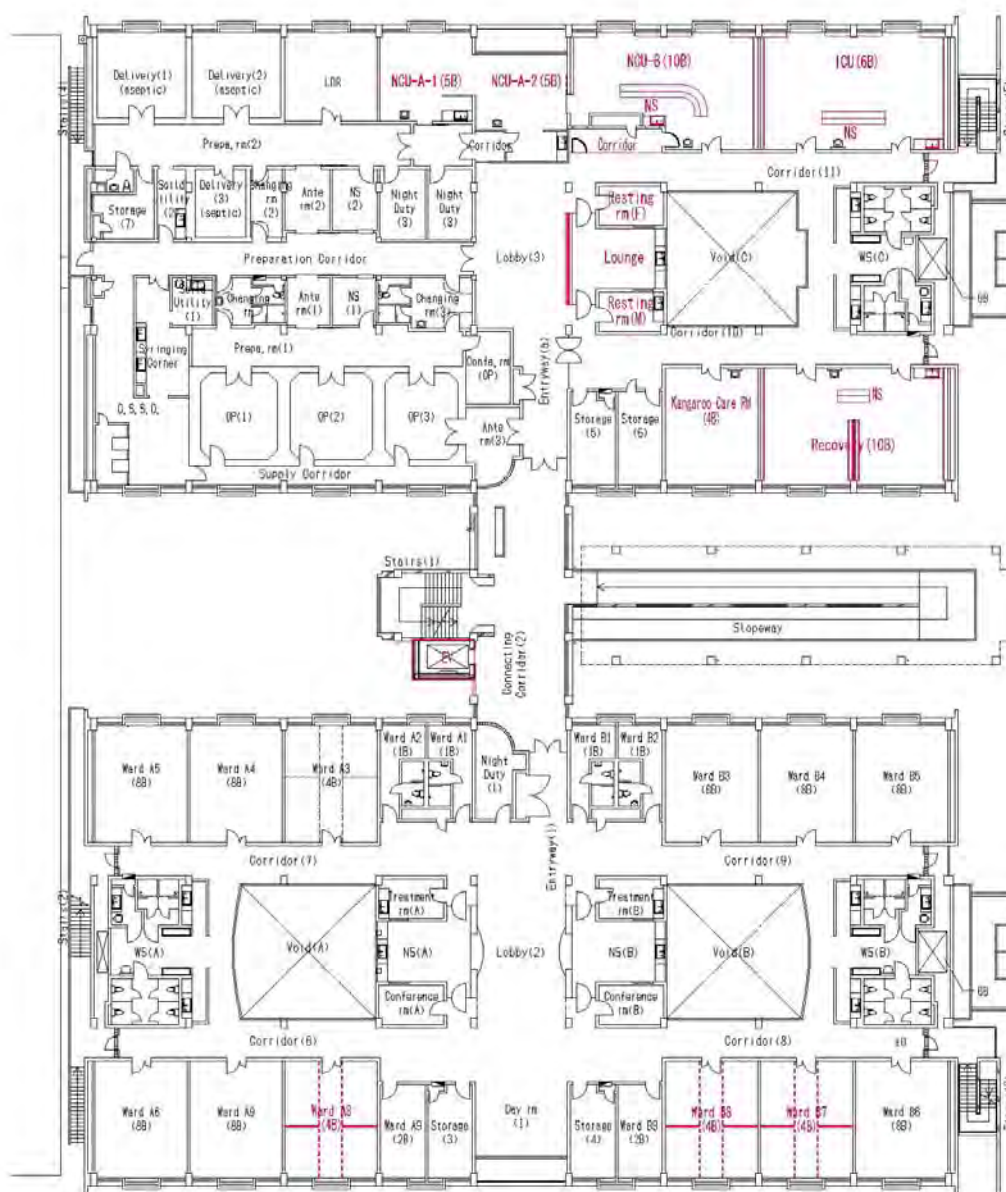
Renovated Existing Center 2<sup>nd</sup> Floor Plan
